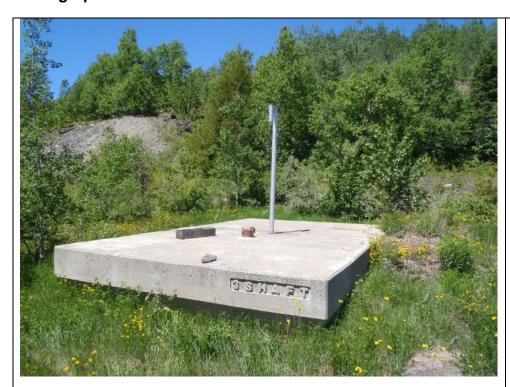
Shaft No. 3 showing new sampling port. Facing west.
